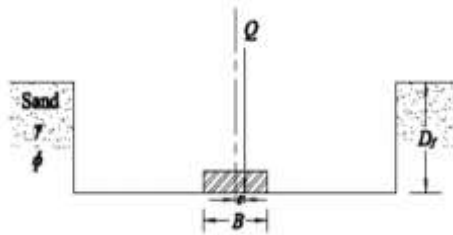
Eccentrically loaded circular footing (B =Diameter of footing)
